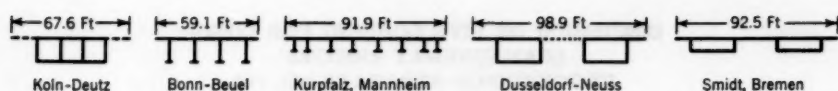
SCHEMATIC CROSS SECTIONS OF THE BRIDGE LISTED IN TABLE 6
